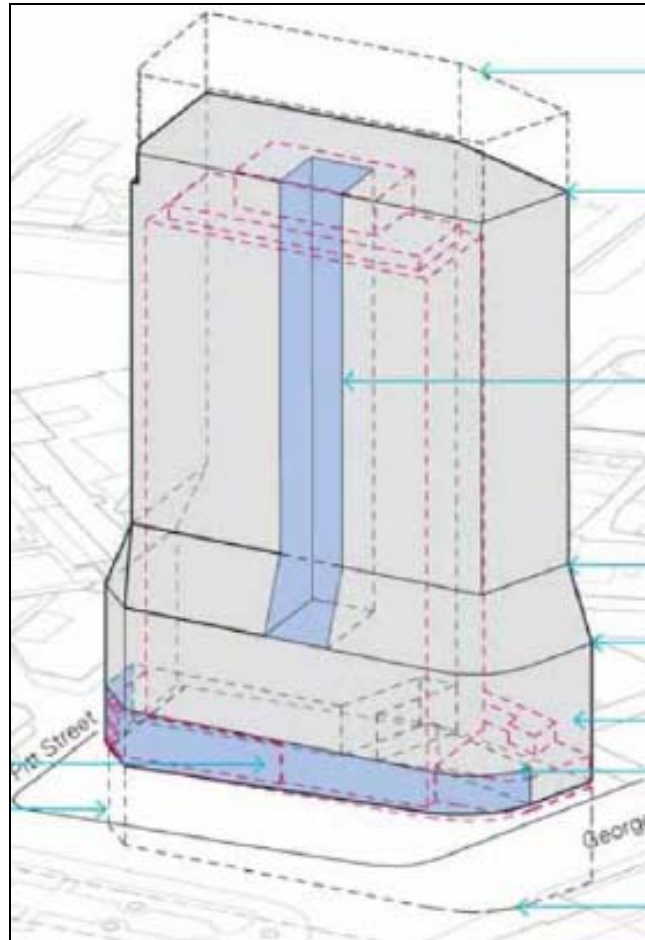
The approved Stage 1 building envelope for the adjacent site at 19-31 Pitt Street
